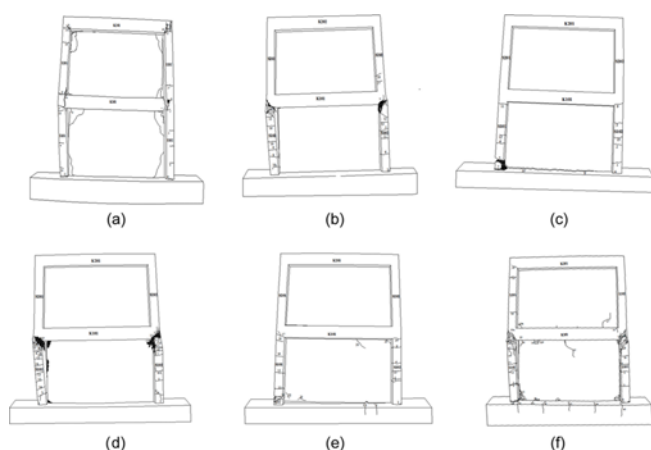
Schematic Shapes of Test Frames after Failure: (a) Specimen 1, (b) Specimen 2, (c) Specimen 3, (d) Specimen 4, (e) Specimen 5, (f) Specimen 6
